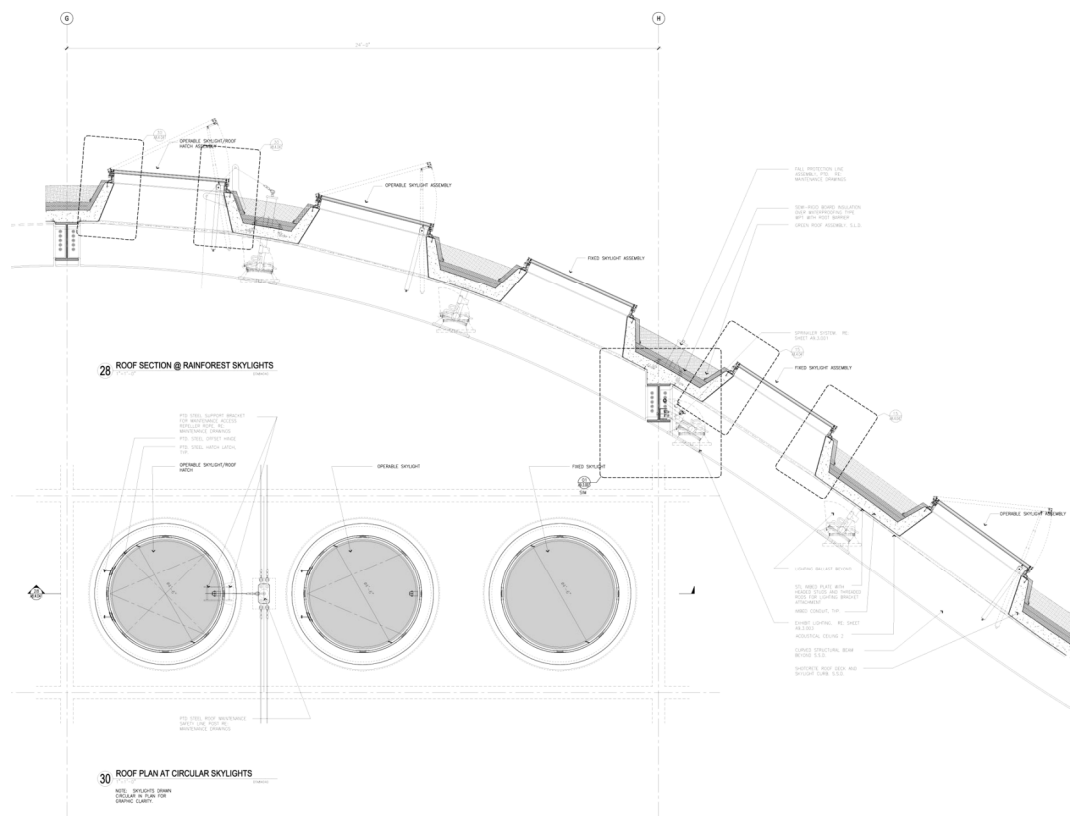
Green Roof Detail Section, California Academy of Sciences (by courtesy of Renzo Piano Building Workshop)
